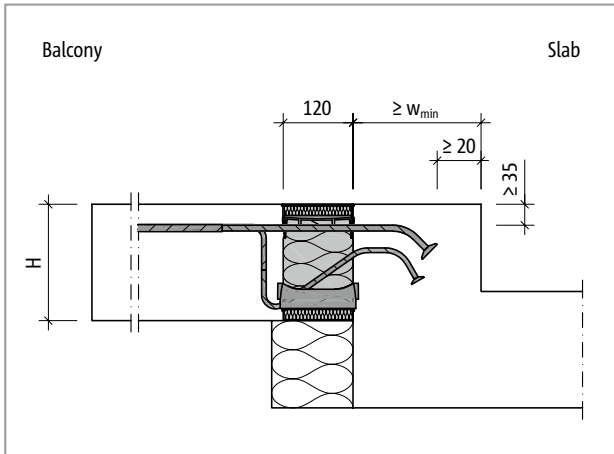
Schöck Isokorb® XT type K-O: Balcony with height offset upwards and external insulation
